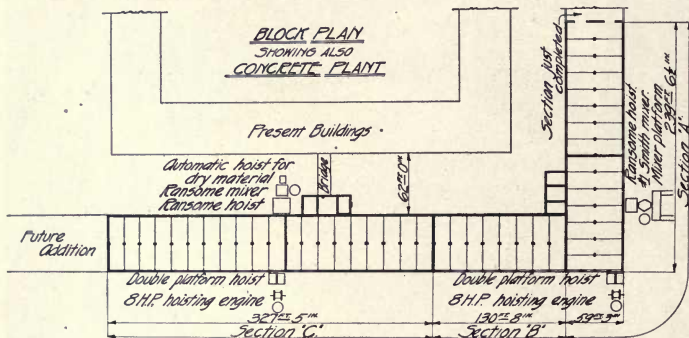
Plan of Construction Plant. (See p. 138.)
